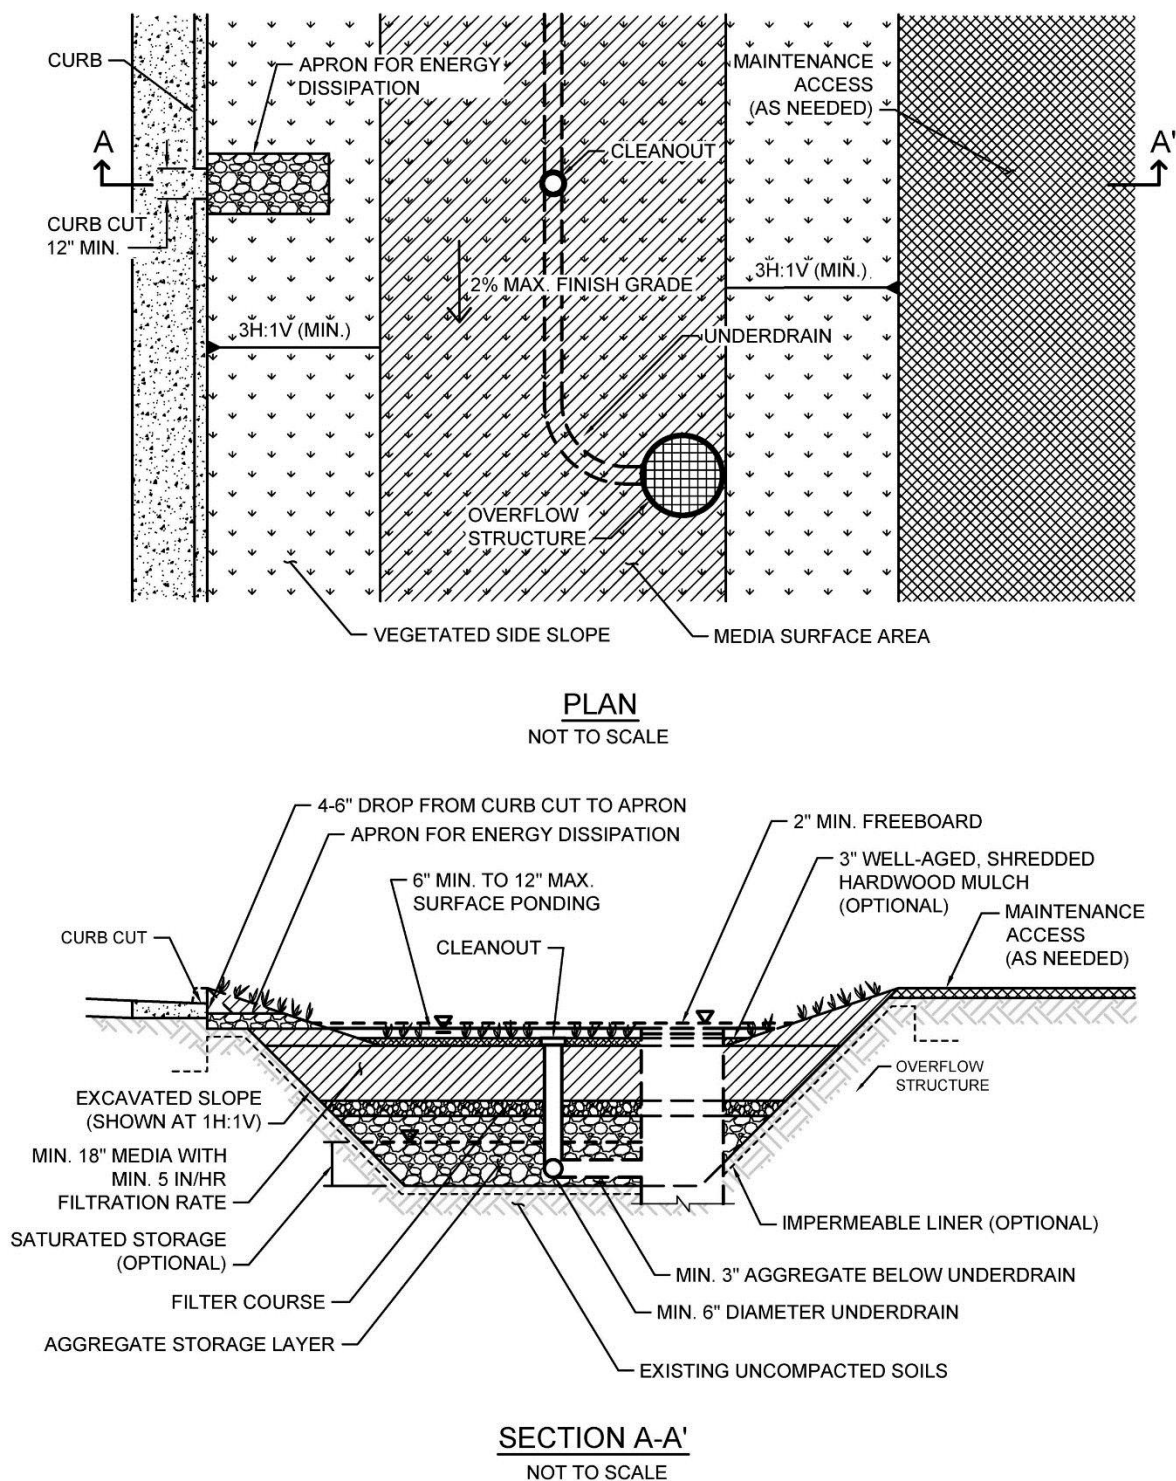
E.13-1: Typical plan and Section view of a Biofiltration BMP
